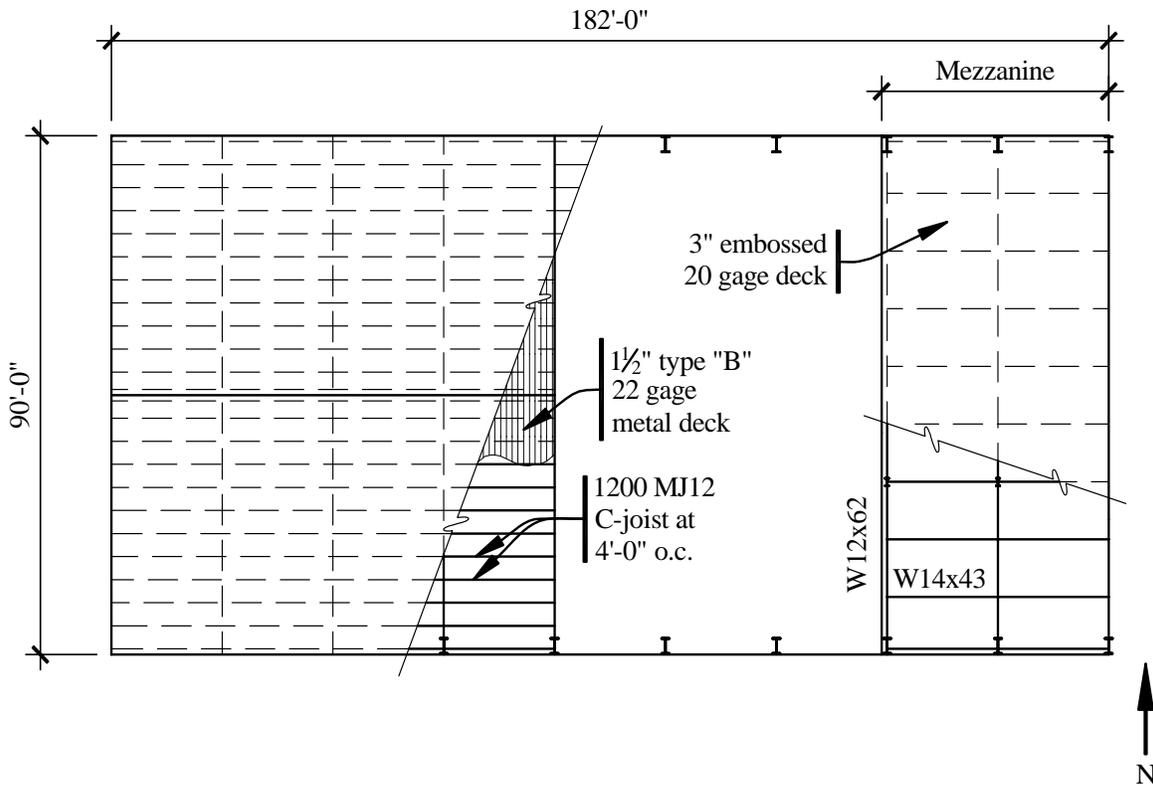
Roof framing and mezzanine framing plan (1.0 in. = 25.4 mm, 1.0 ft = 0.3048 m).
